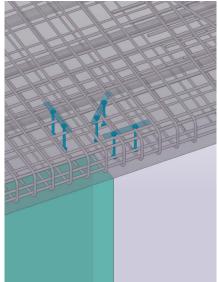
PUNCHING SHEAR DESIGN OF A SLAB WITH PSB® PUNCHING REINFORCEMENT AT BLADE COLUMN ENDS, ©RAMBOLL
